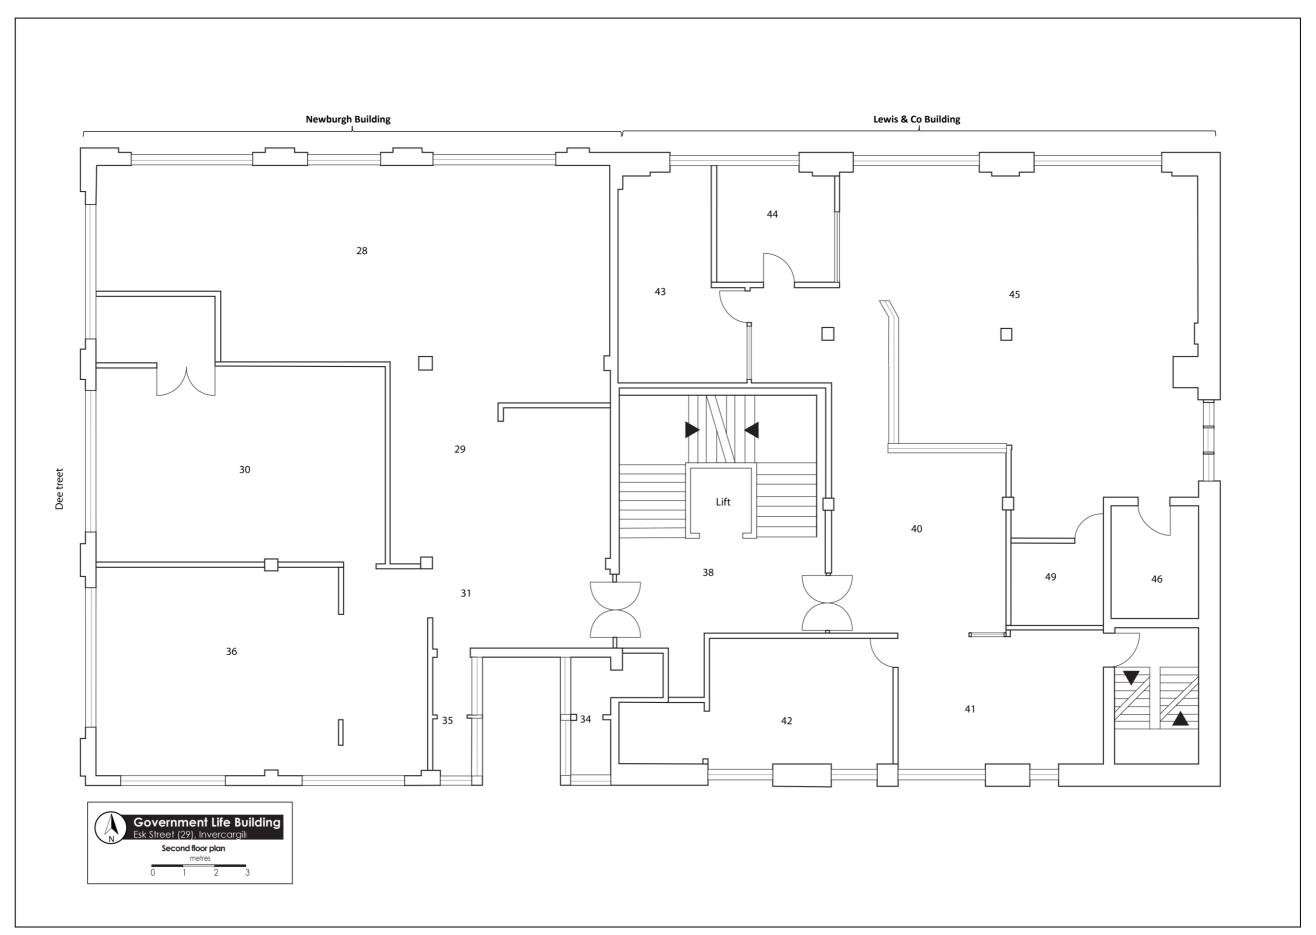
Second floor plan of the Lewis & Co. (right) and the Newburgh (left) Buildings, collectively known as the Government Life Building.
